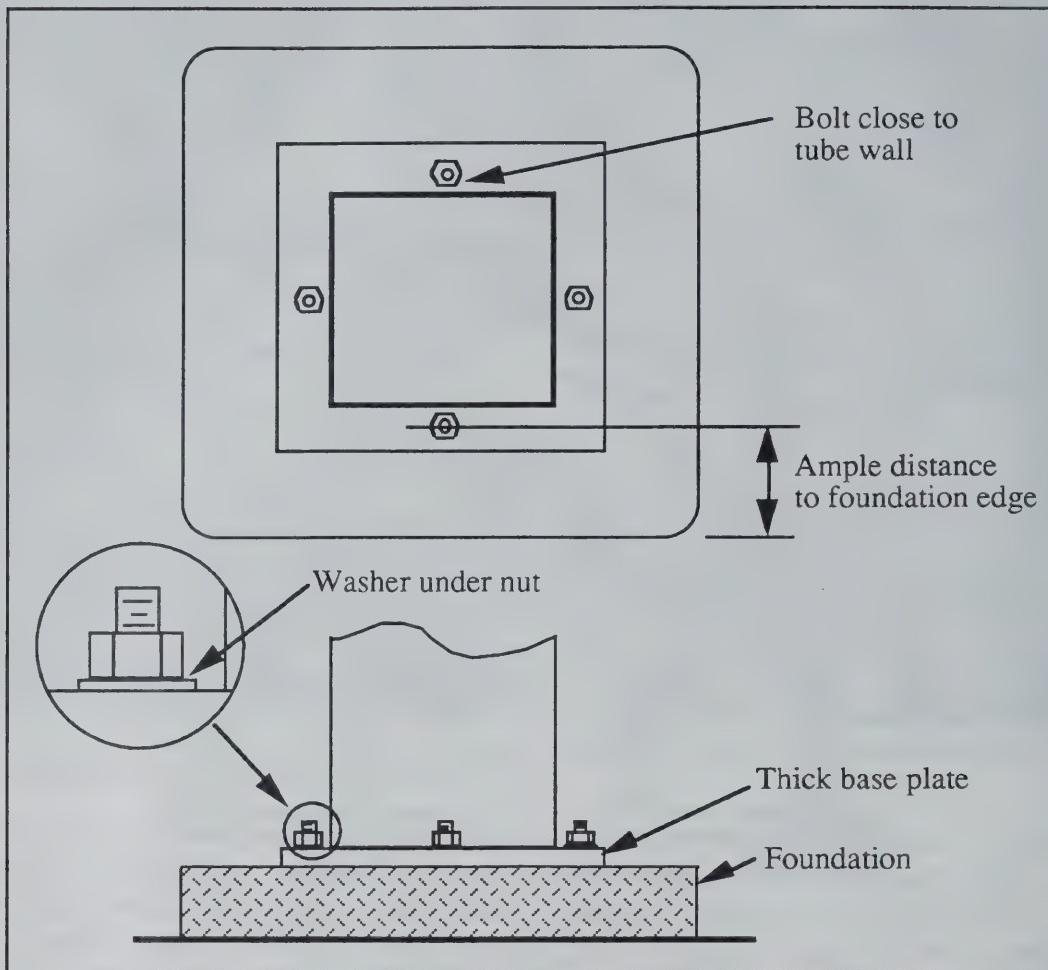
Schematic diagram showing details for a stiff anchorage.
